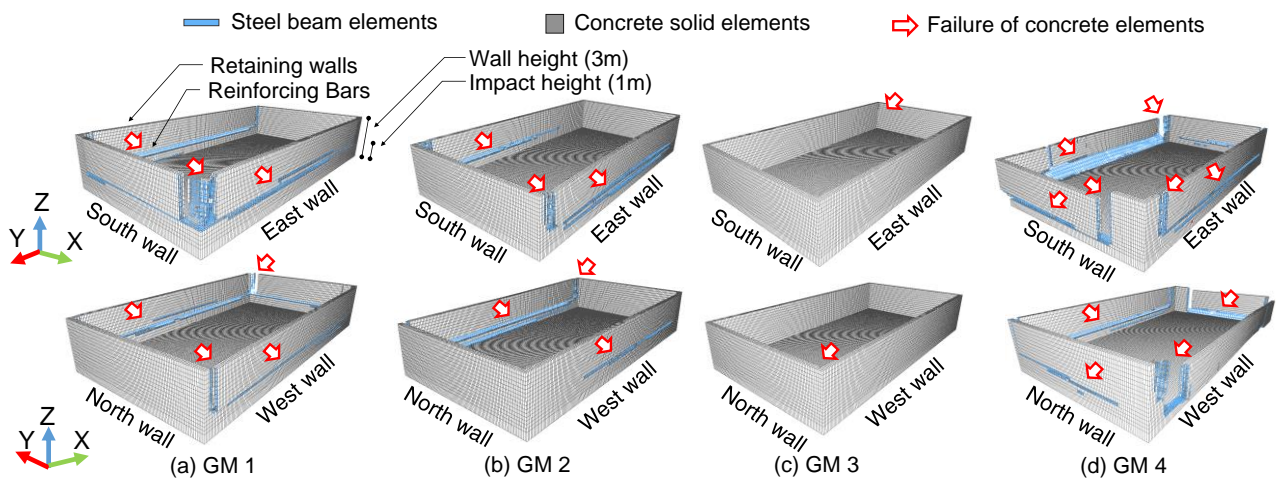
Failure of concrete and reinforcing bar elements of moat walls at the end of each analysis
